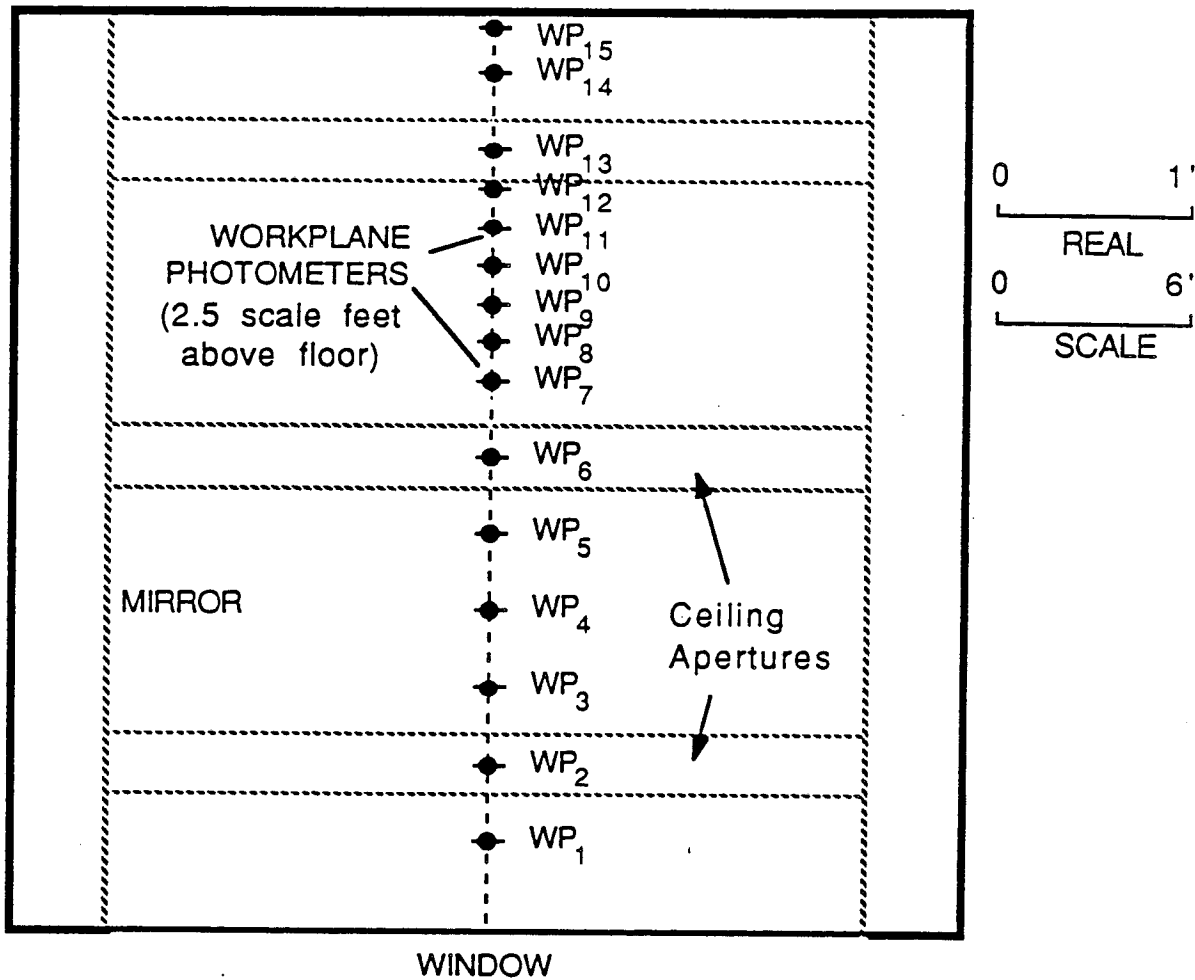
Floor plan and reflected ceiling diagram of semi-infinite room
